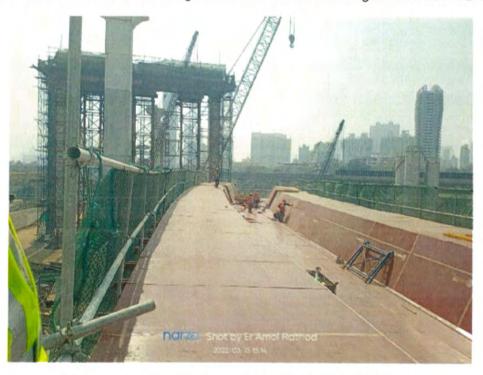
EP 14 Cast In-Situ Shuttering work in progress
